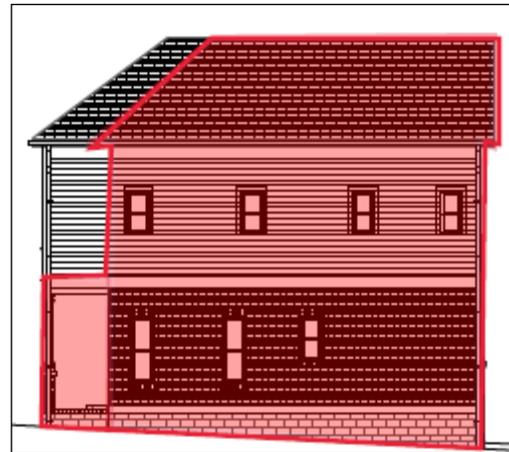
shows staff's recommended changes to the form of two infills facing 5th Avenue North, namely that the second floor line up with the first floor.
